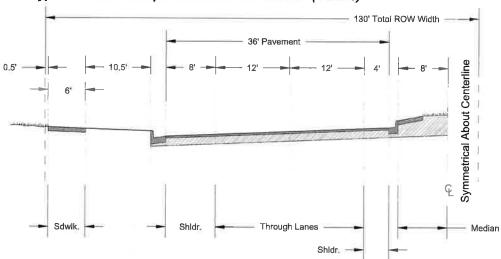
Typical Urban Principal Arterial Cross Section (4 Lane)
